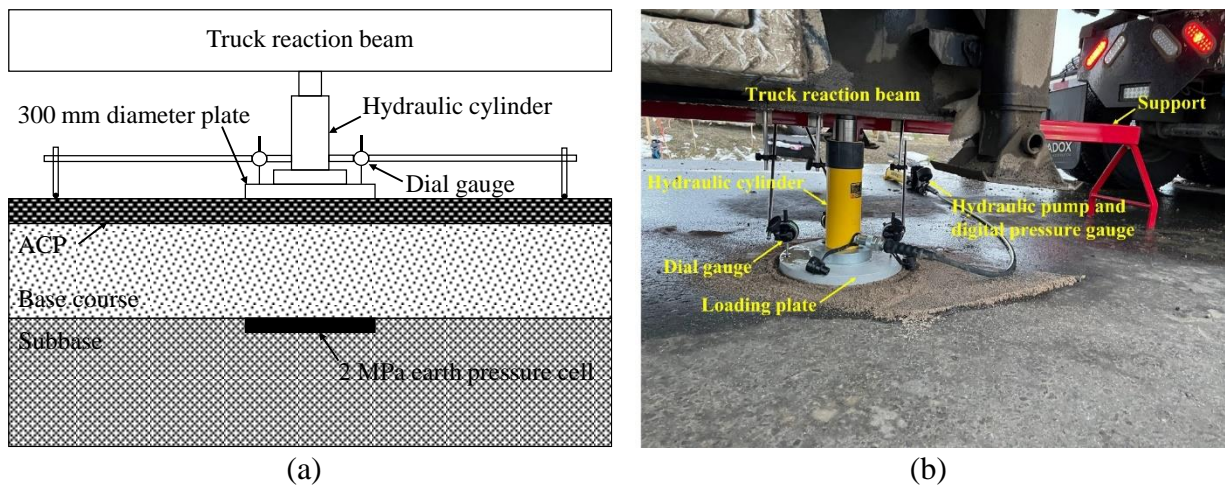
Setup of plate loading tests: (a) schematic and (b) photograph
